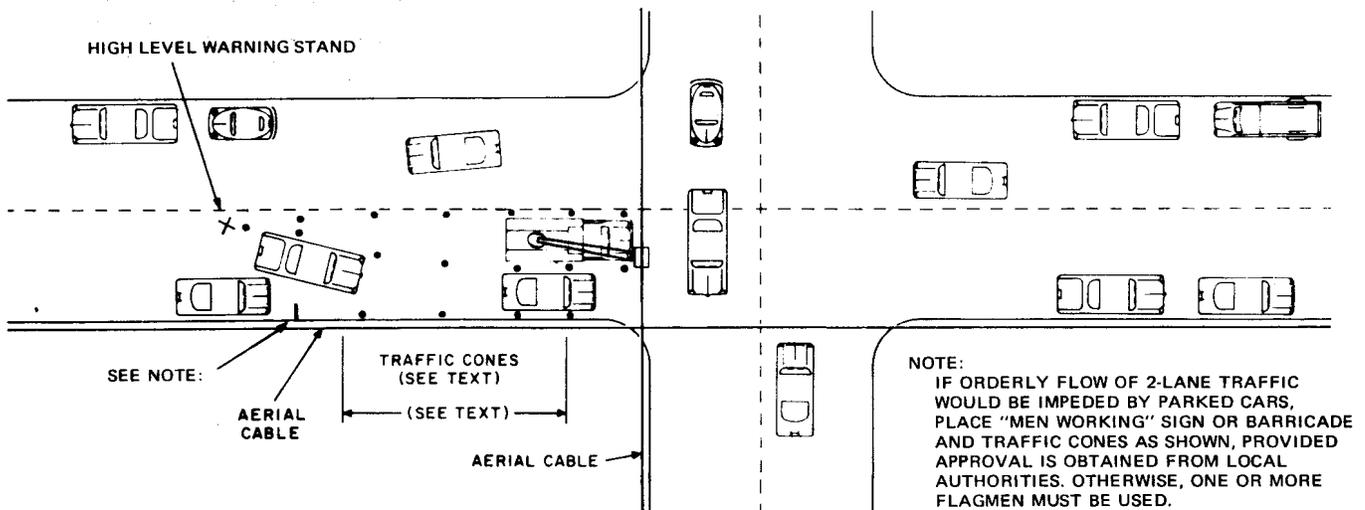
Placement of Warning Devices on City Street - Aerial Plant Near Intersection
